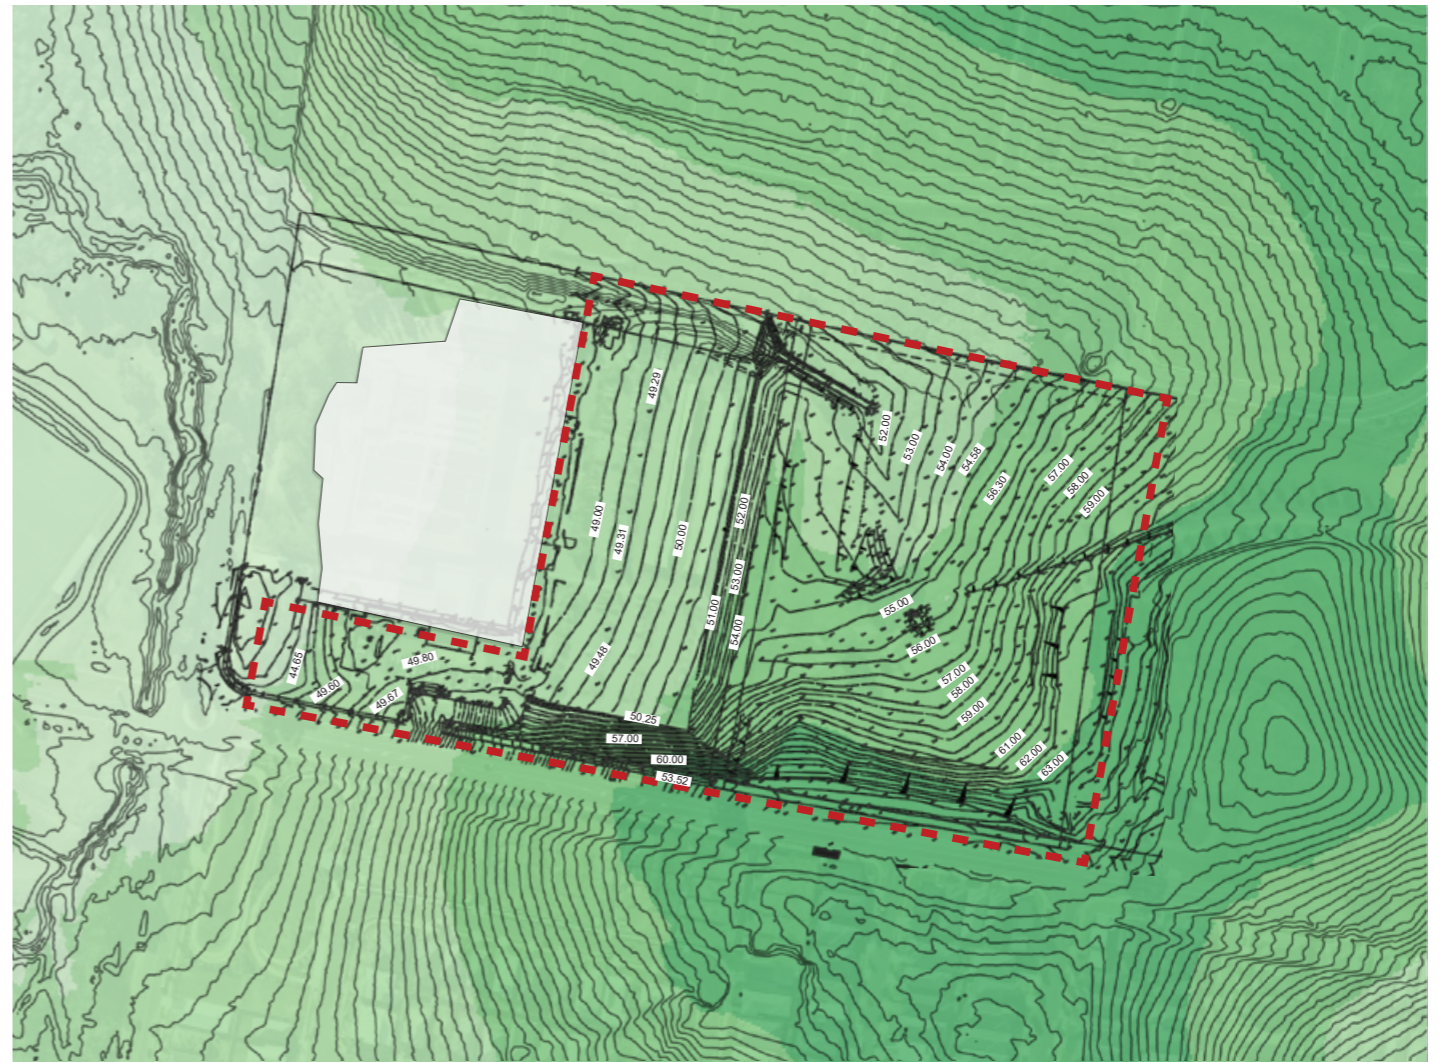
Subject Site (Post Earthworks) Topography and Elevation Analysis Diagram
